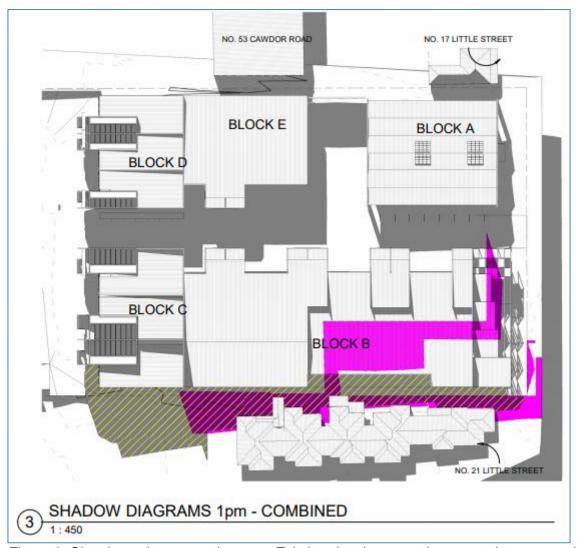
Showing solar access impacts. Existing development shown purple, proposed shown grey with yellow hatching.
